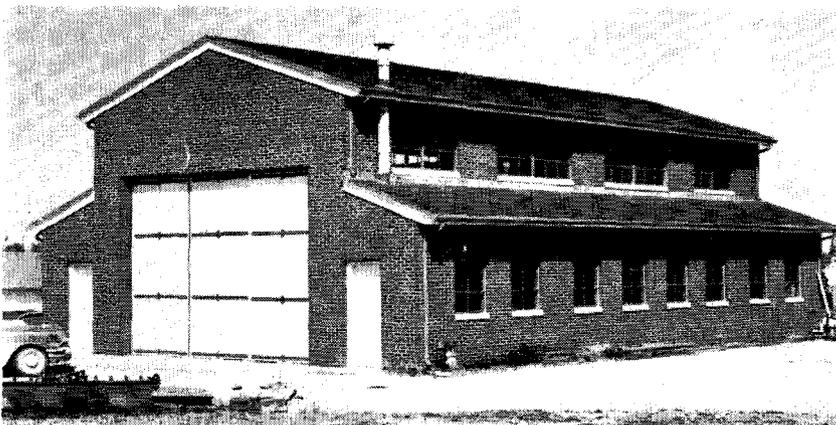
A modern machine shop was erected in 1951 at a cost of \$16,772. It was built of brick and conformed in design and construction with other major buildings on the campus.
